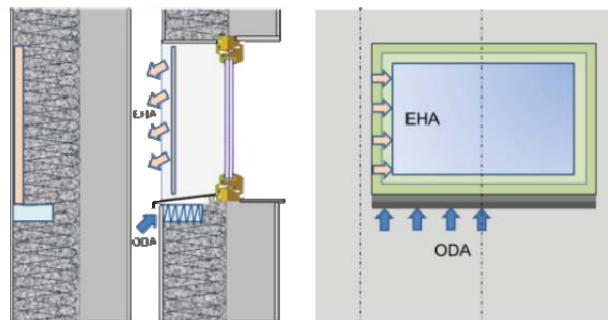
Wall integration of the system within the insulation, outdoor air intake below the windowsill, exhaust air outlet in the reveal [5]
